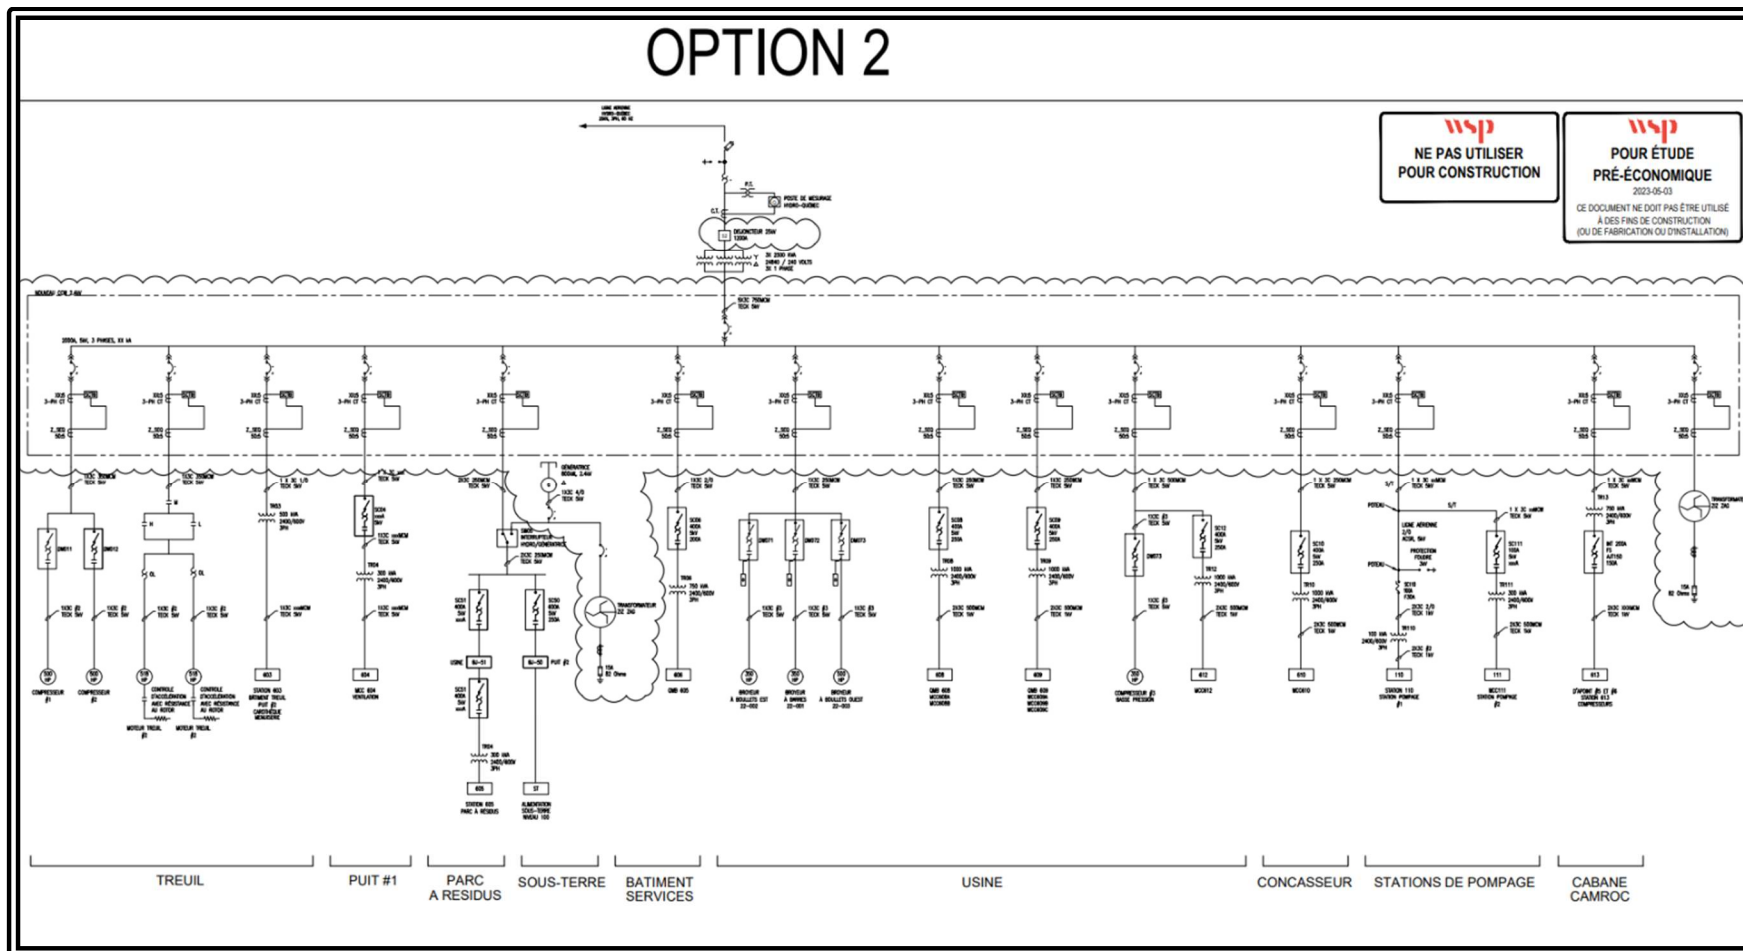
Option 2 SLD – Drawing # 0000-E001-0201-0A
